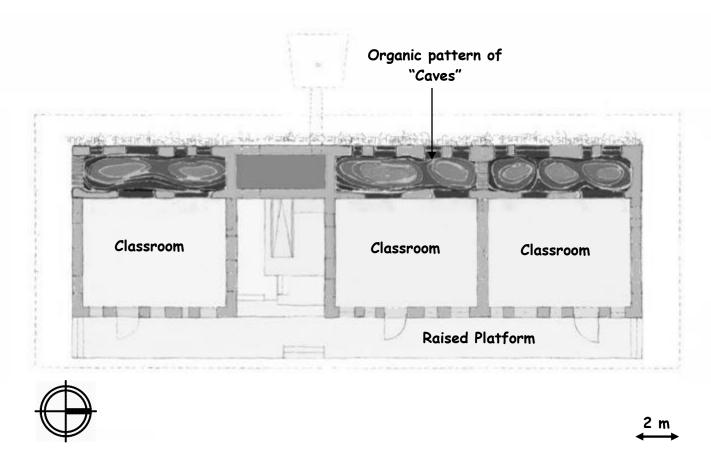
Ground Floor Plan of METI School (ArchSociety, 2008)
